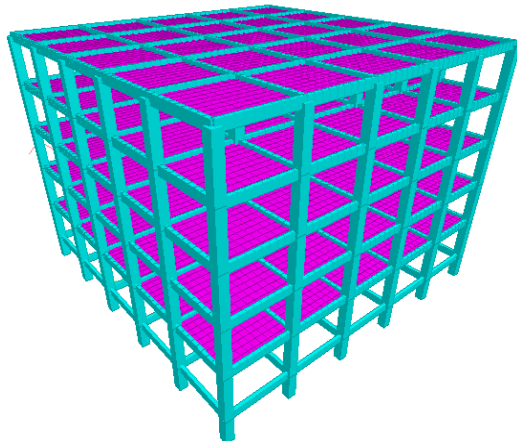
Model of Conventional building without Masonry Infill Wall
